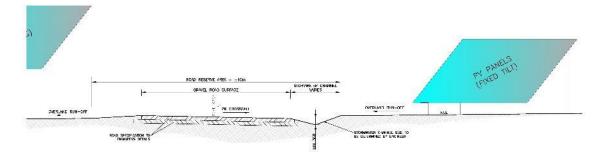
1 Typical Gravel Road & Cut-Off Drain
